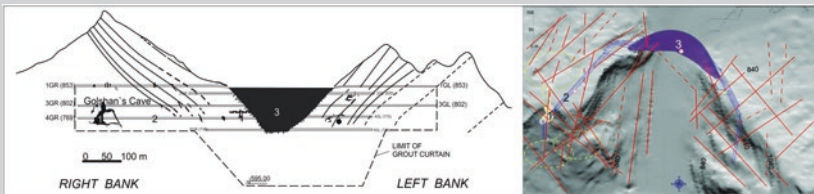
DEM of dam site with spatial position of the main caverns, grouting galleries, and faults. 1 Golshan’s Cave, 2 Grouting galleries, and 3 Salman Farsi Dam
